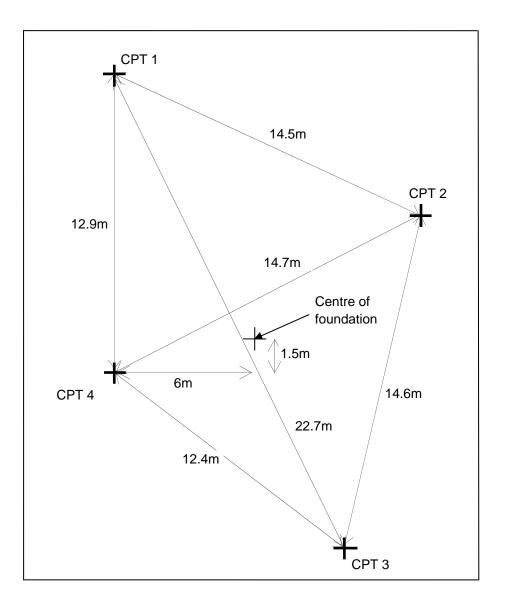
Example 2.1 Site plan and location of CPT tests
